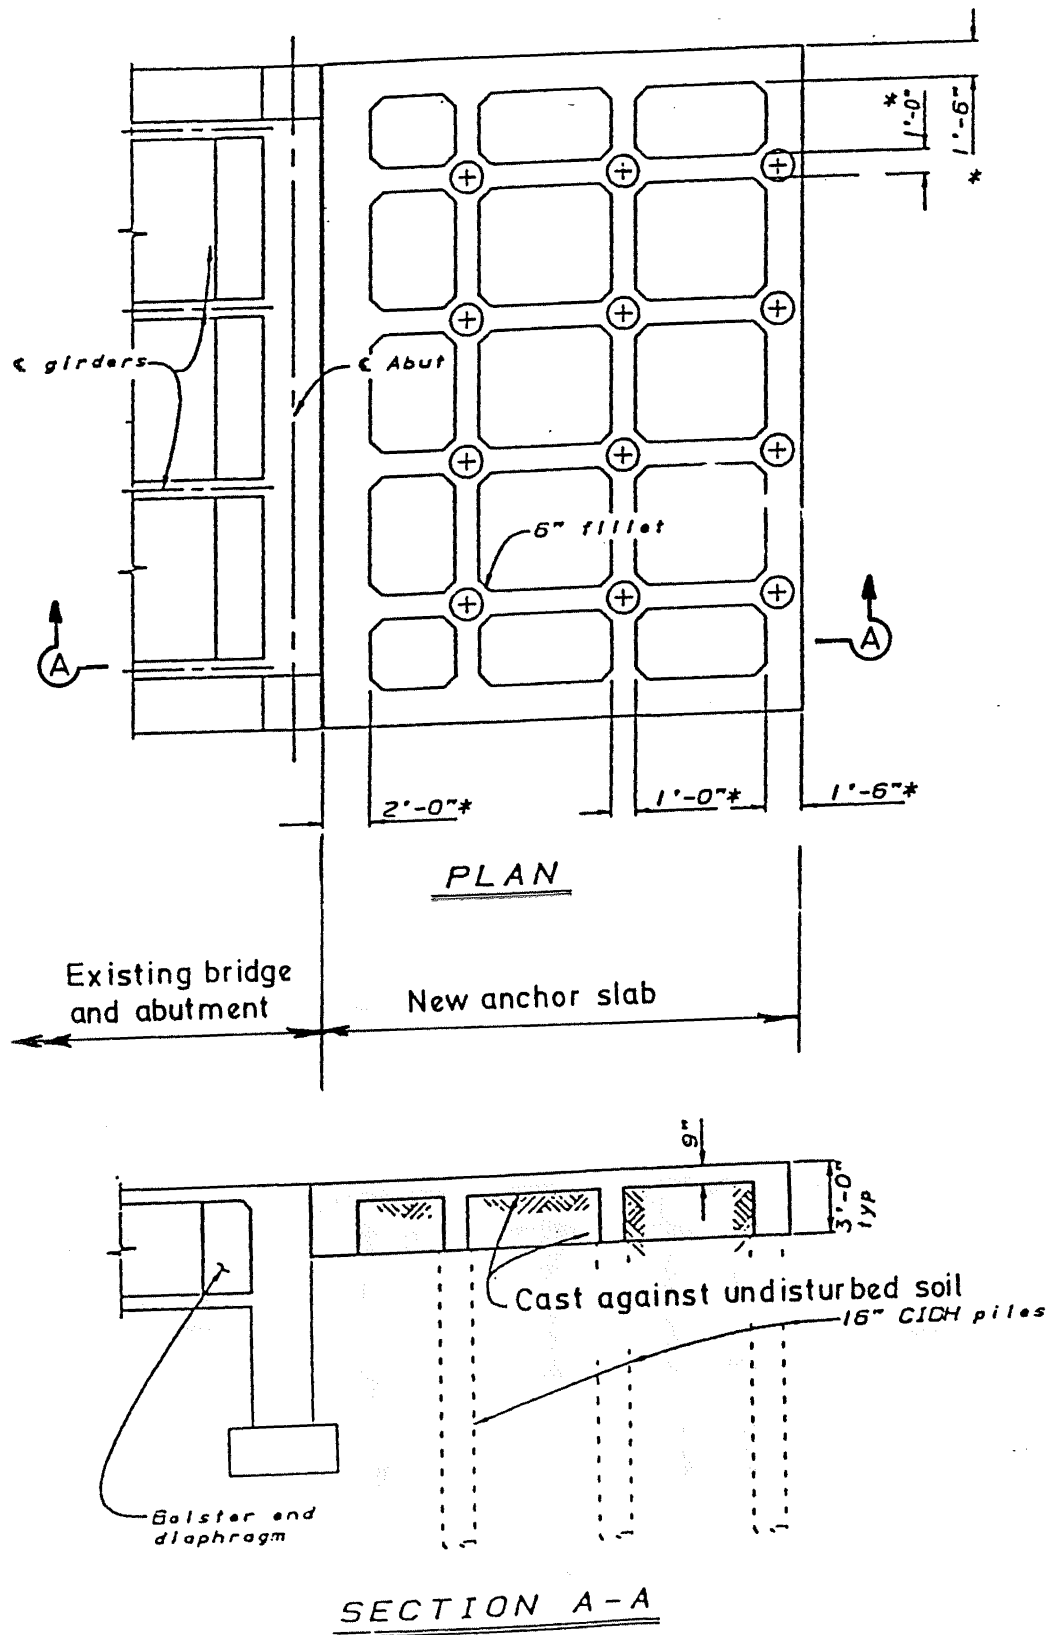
Abutment retrofit using new anchor slab and piles [Caltrans 1992].
